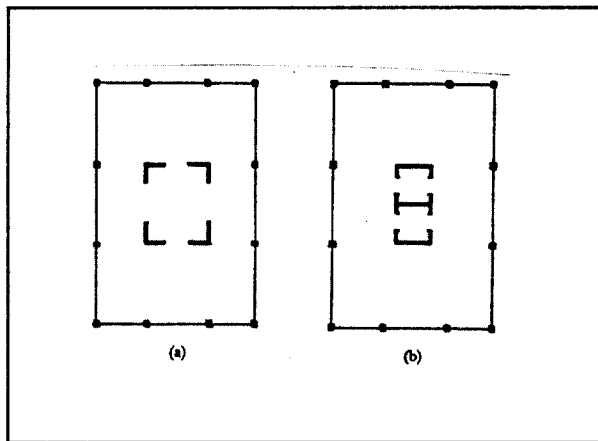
Arrangement of shear walls and braced frames – not recommended. Note that the heavy lines indicate shear walls and/or braced frames.
